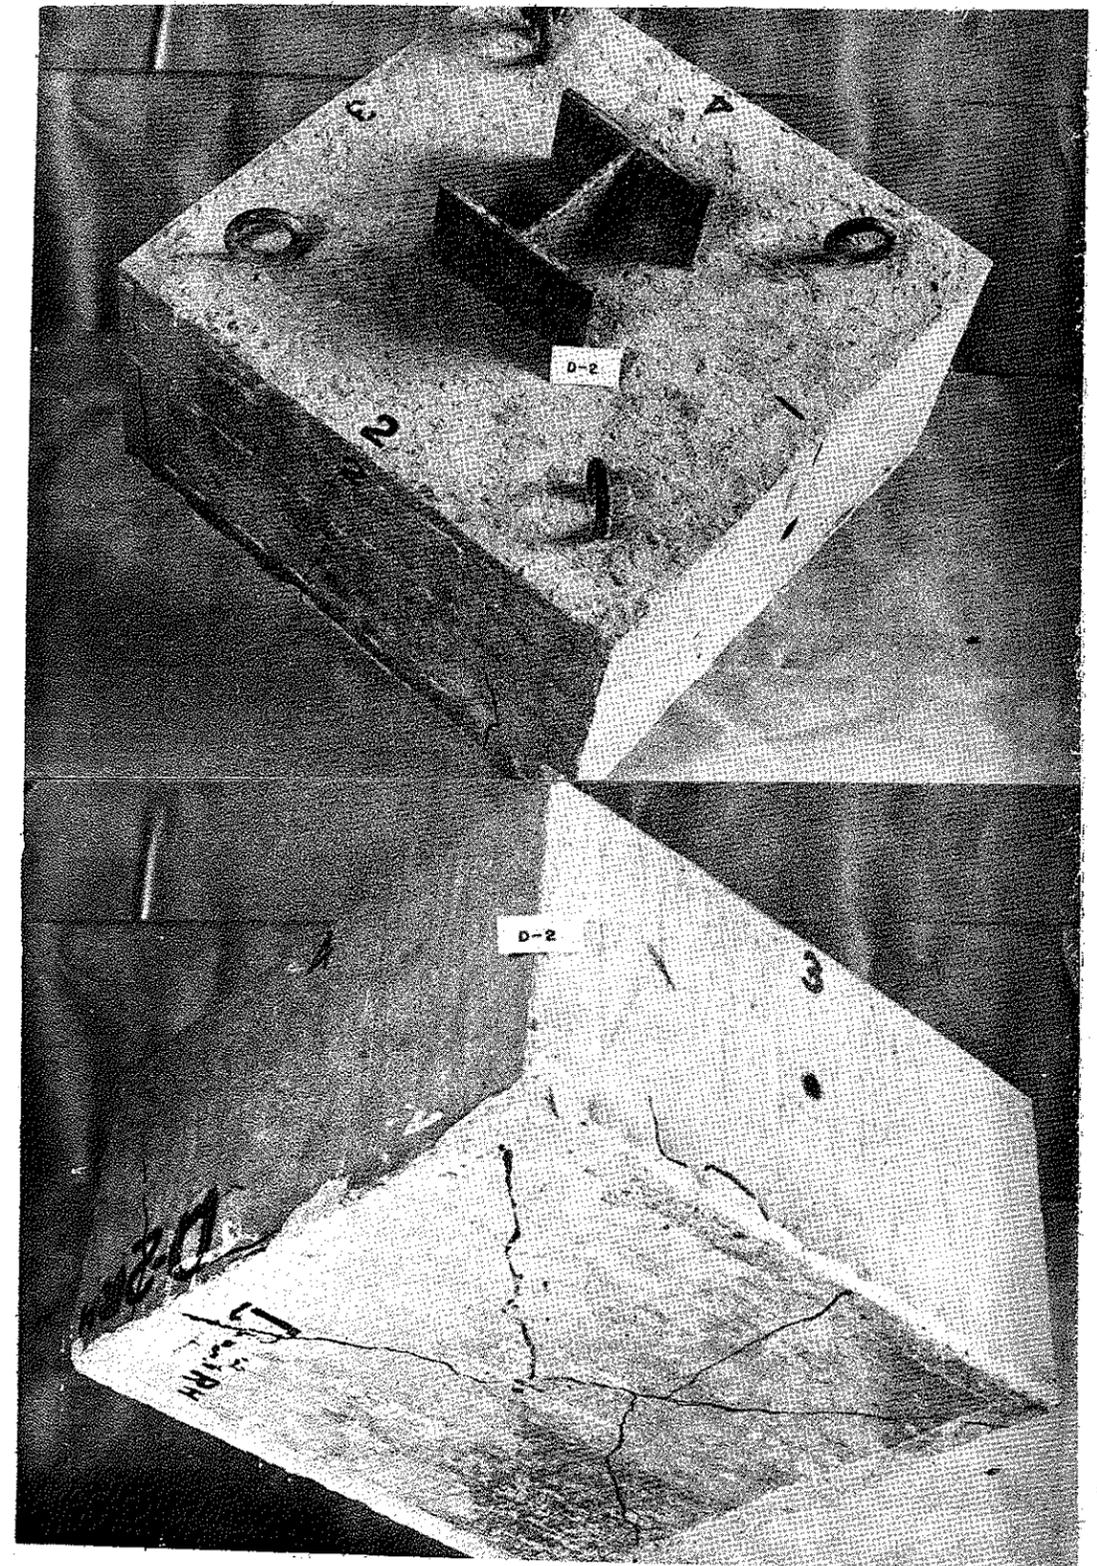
APPEARANCE OF SPECIMEN D-2 AFTER TESTING.
